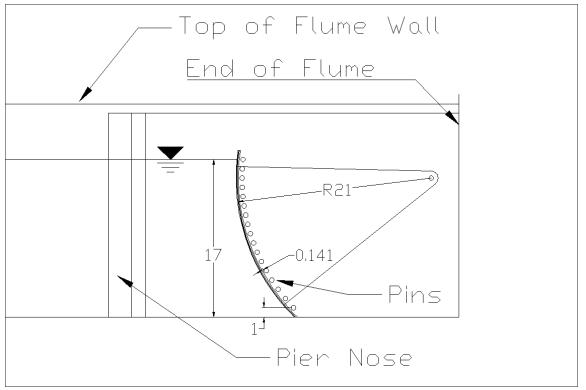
Profile view of model gate, pier walls, and gate catcher pins. Dimensions are in model inches and prototype feet. Dimensions of the gate and pier walls were scaled from radial gates at Echo Dam.
